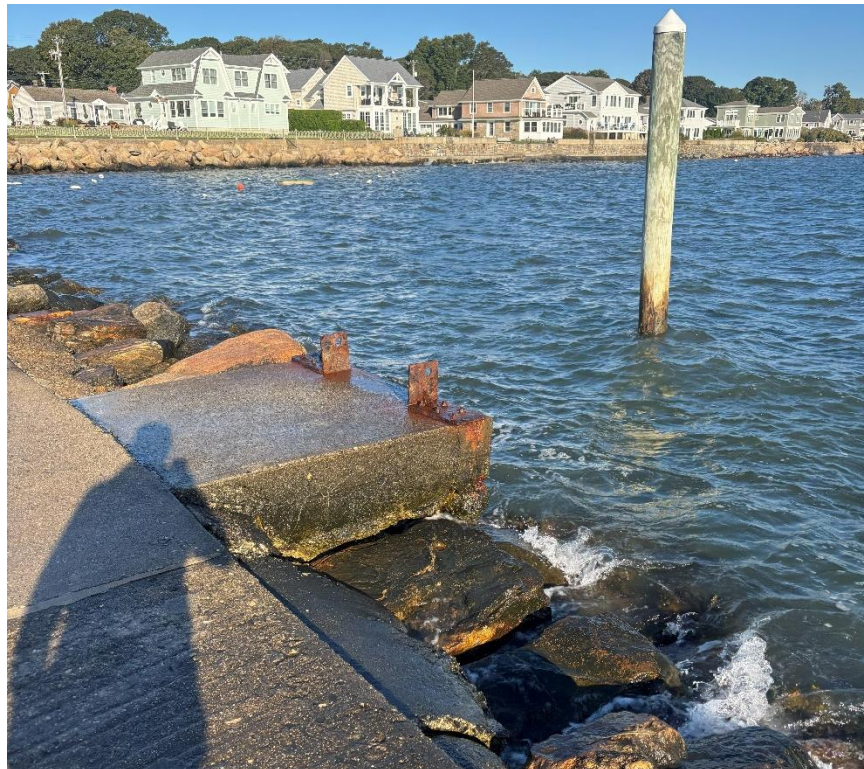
Nehantic pier partially cantilevered ramp landing platform
